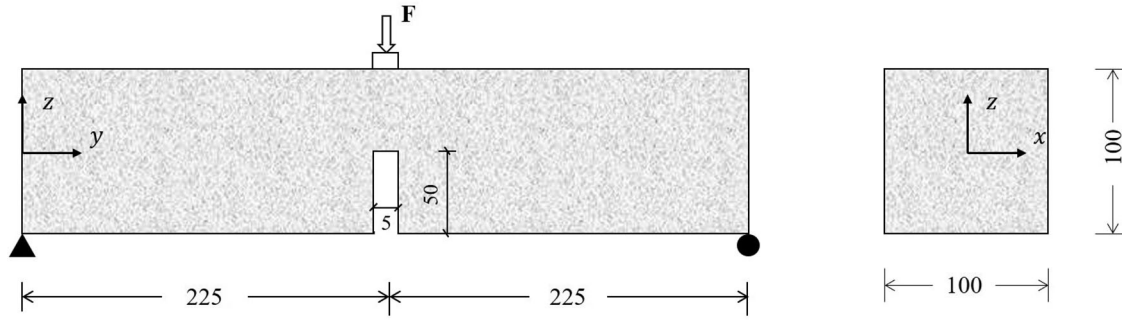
Dimensions of the notched beam for TPB test (Unit: mm).
